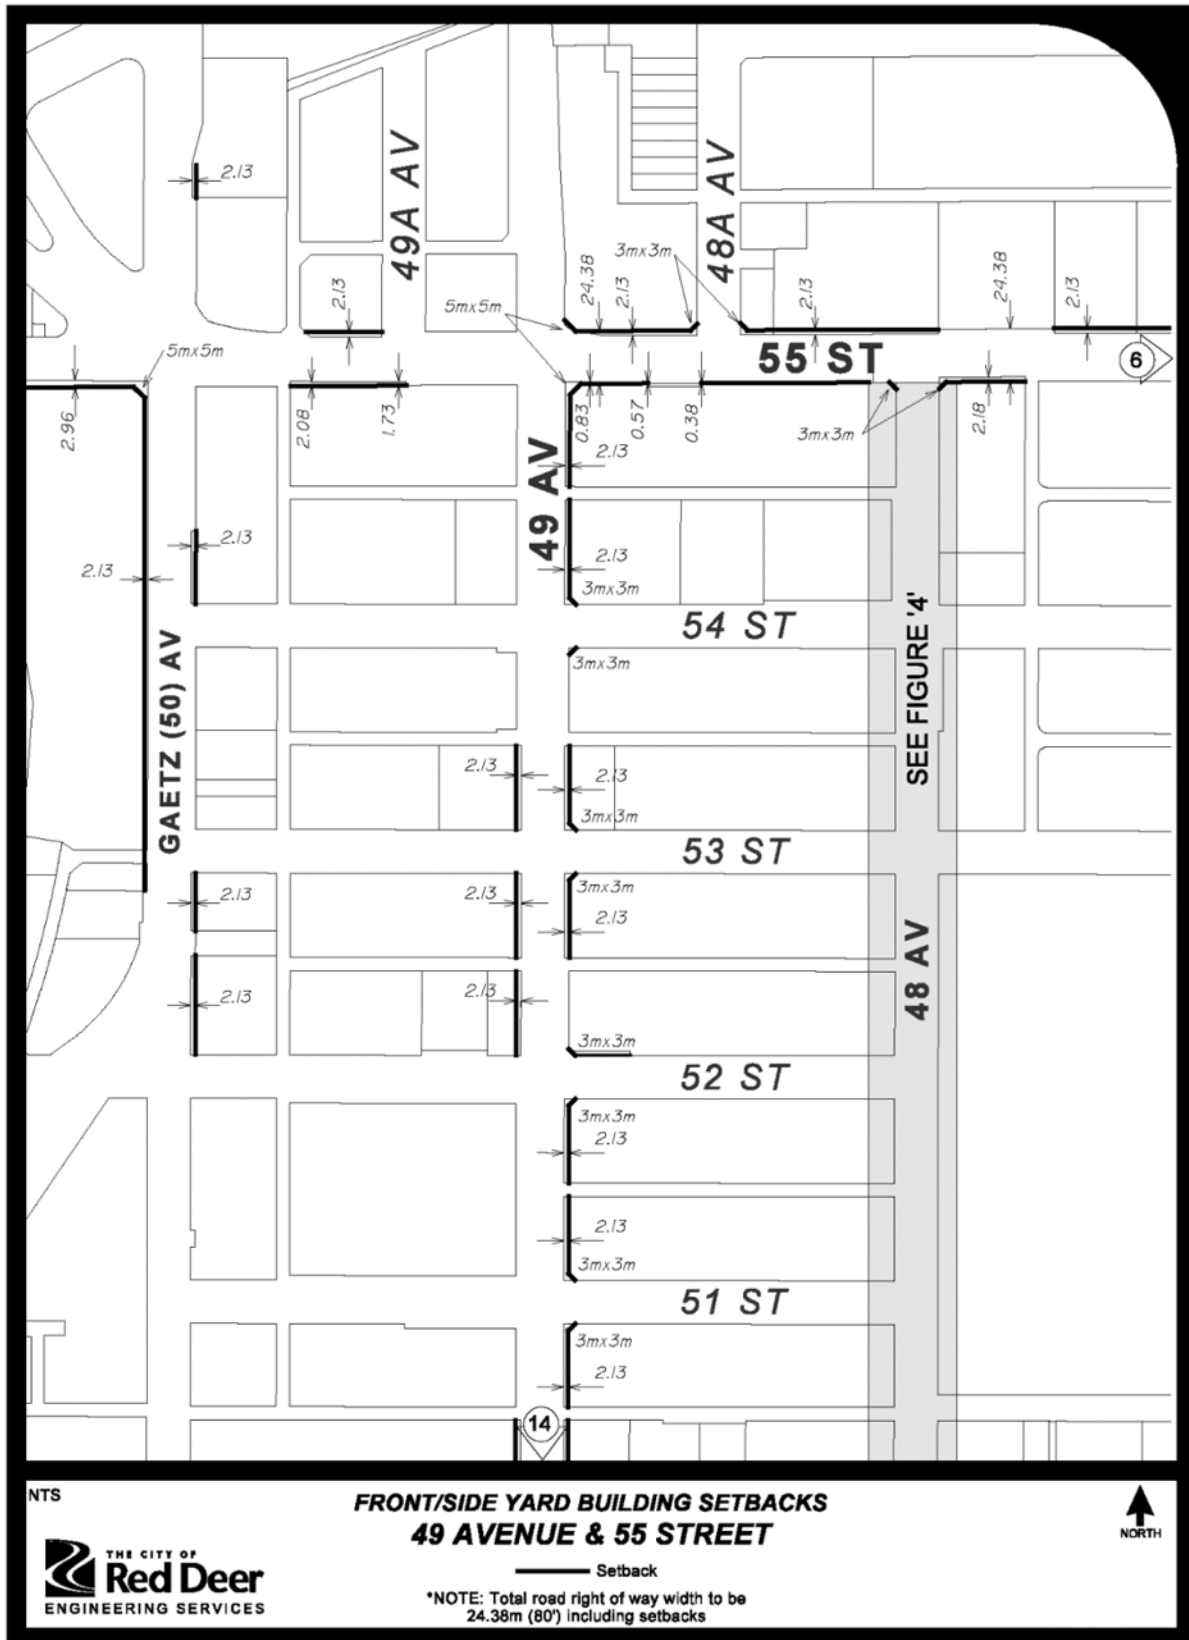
Front and Side Yard Building Setbacks - 49 Avenue & 55 Street
